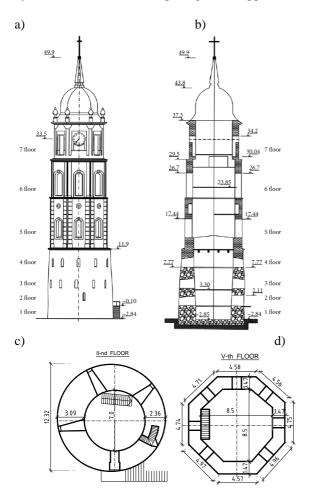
The Arch-Cathedral Belfry: a) a general view; b) vertical cross section; c) horizontal cross section of the lower part; d) horizontal cross section of the upper part.
